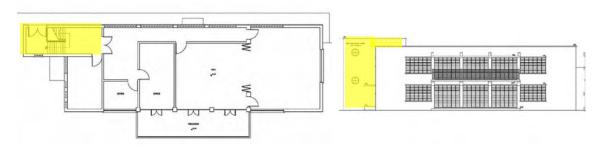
1/F floor plan and elevation of the JPC Building.
